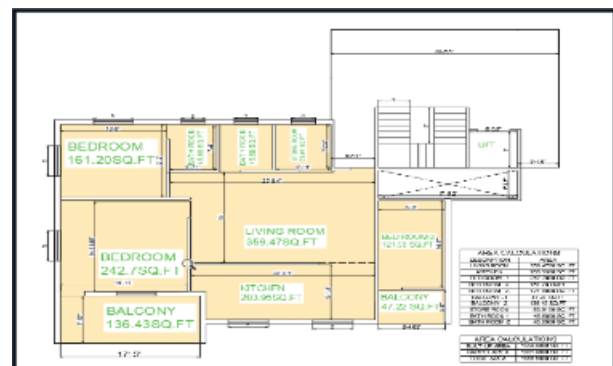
TYPICAL COMMON FLOOR PLAN OF RESIDENTIAL FLAT
